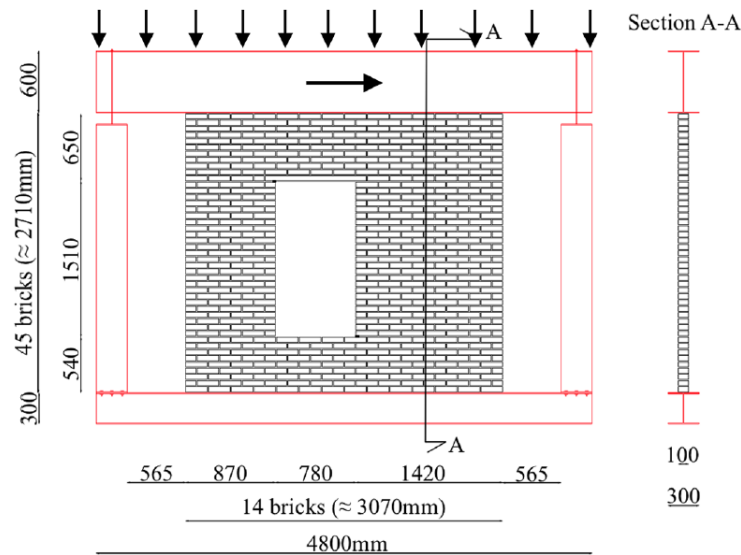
Test setup and dimensions of the un-strengthened wall from the experiment by (Korswagen et al., [2019](#))
